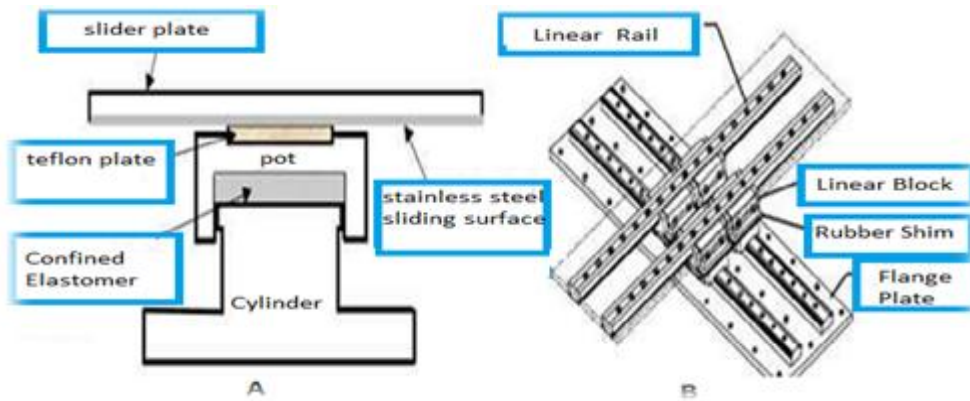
Horizontal sliding bearings: a) Pot bearing, b) Rail roller bearing [44].
